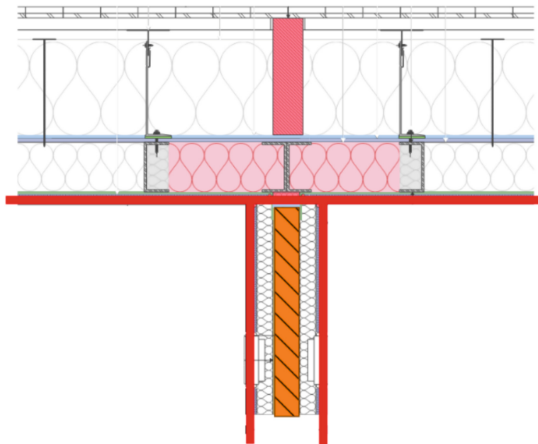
Plan detail view where a CLT wall meets the zone of external façade, showing encapsulation (red) wrapping the end of the CLT wall (orange & hatched)
